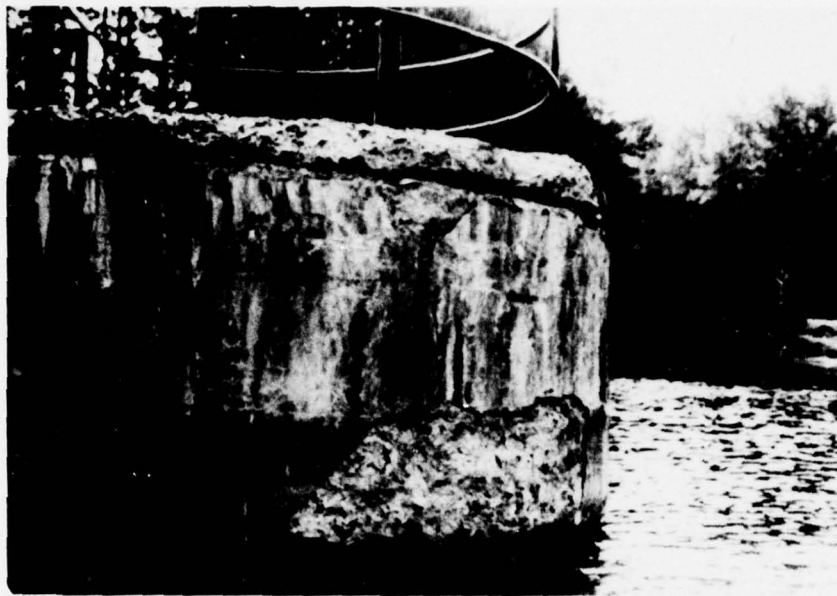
SPALLING AND SCALING OF THE INTAKE STRUCTURE
